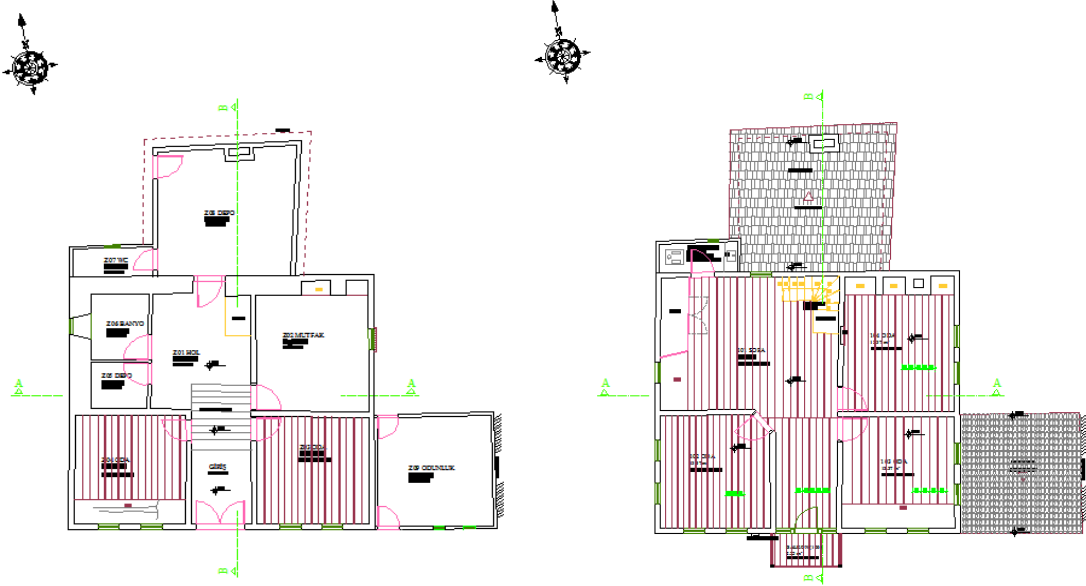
İbrahim Pilavcı House's view rolve of ground floor and first floor ceiling plans.
